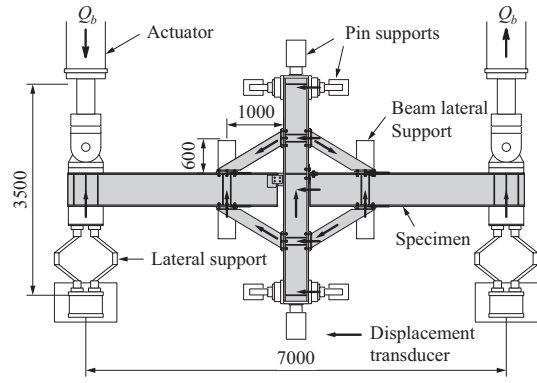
Setup of weld-free specimen and instrumentation (unit: mm)
